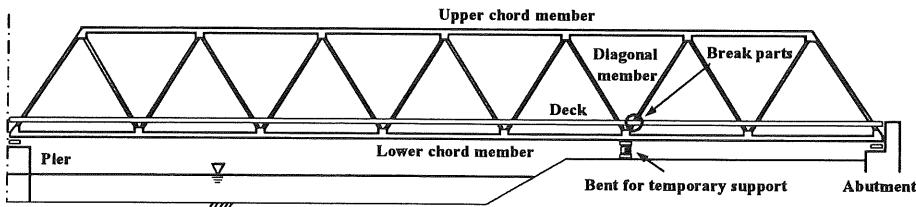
Damage of diagonal member in Warren truss bridge and its temporary protection.
